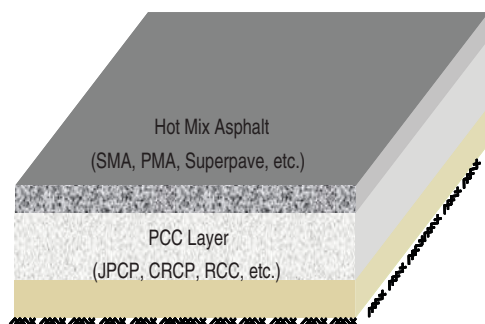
Typical cross section for HMA/PCC composite pavements.
